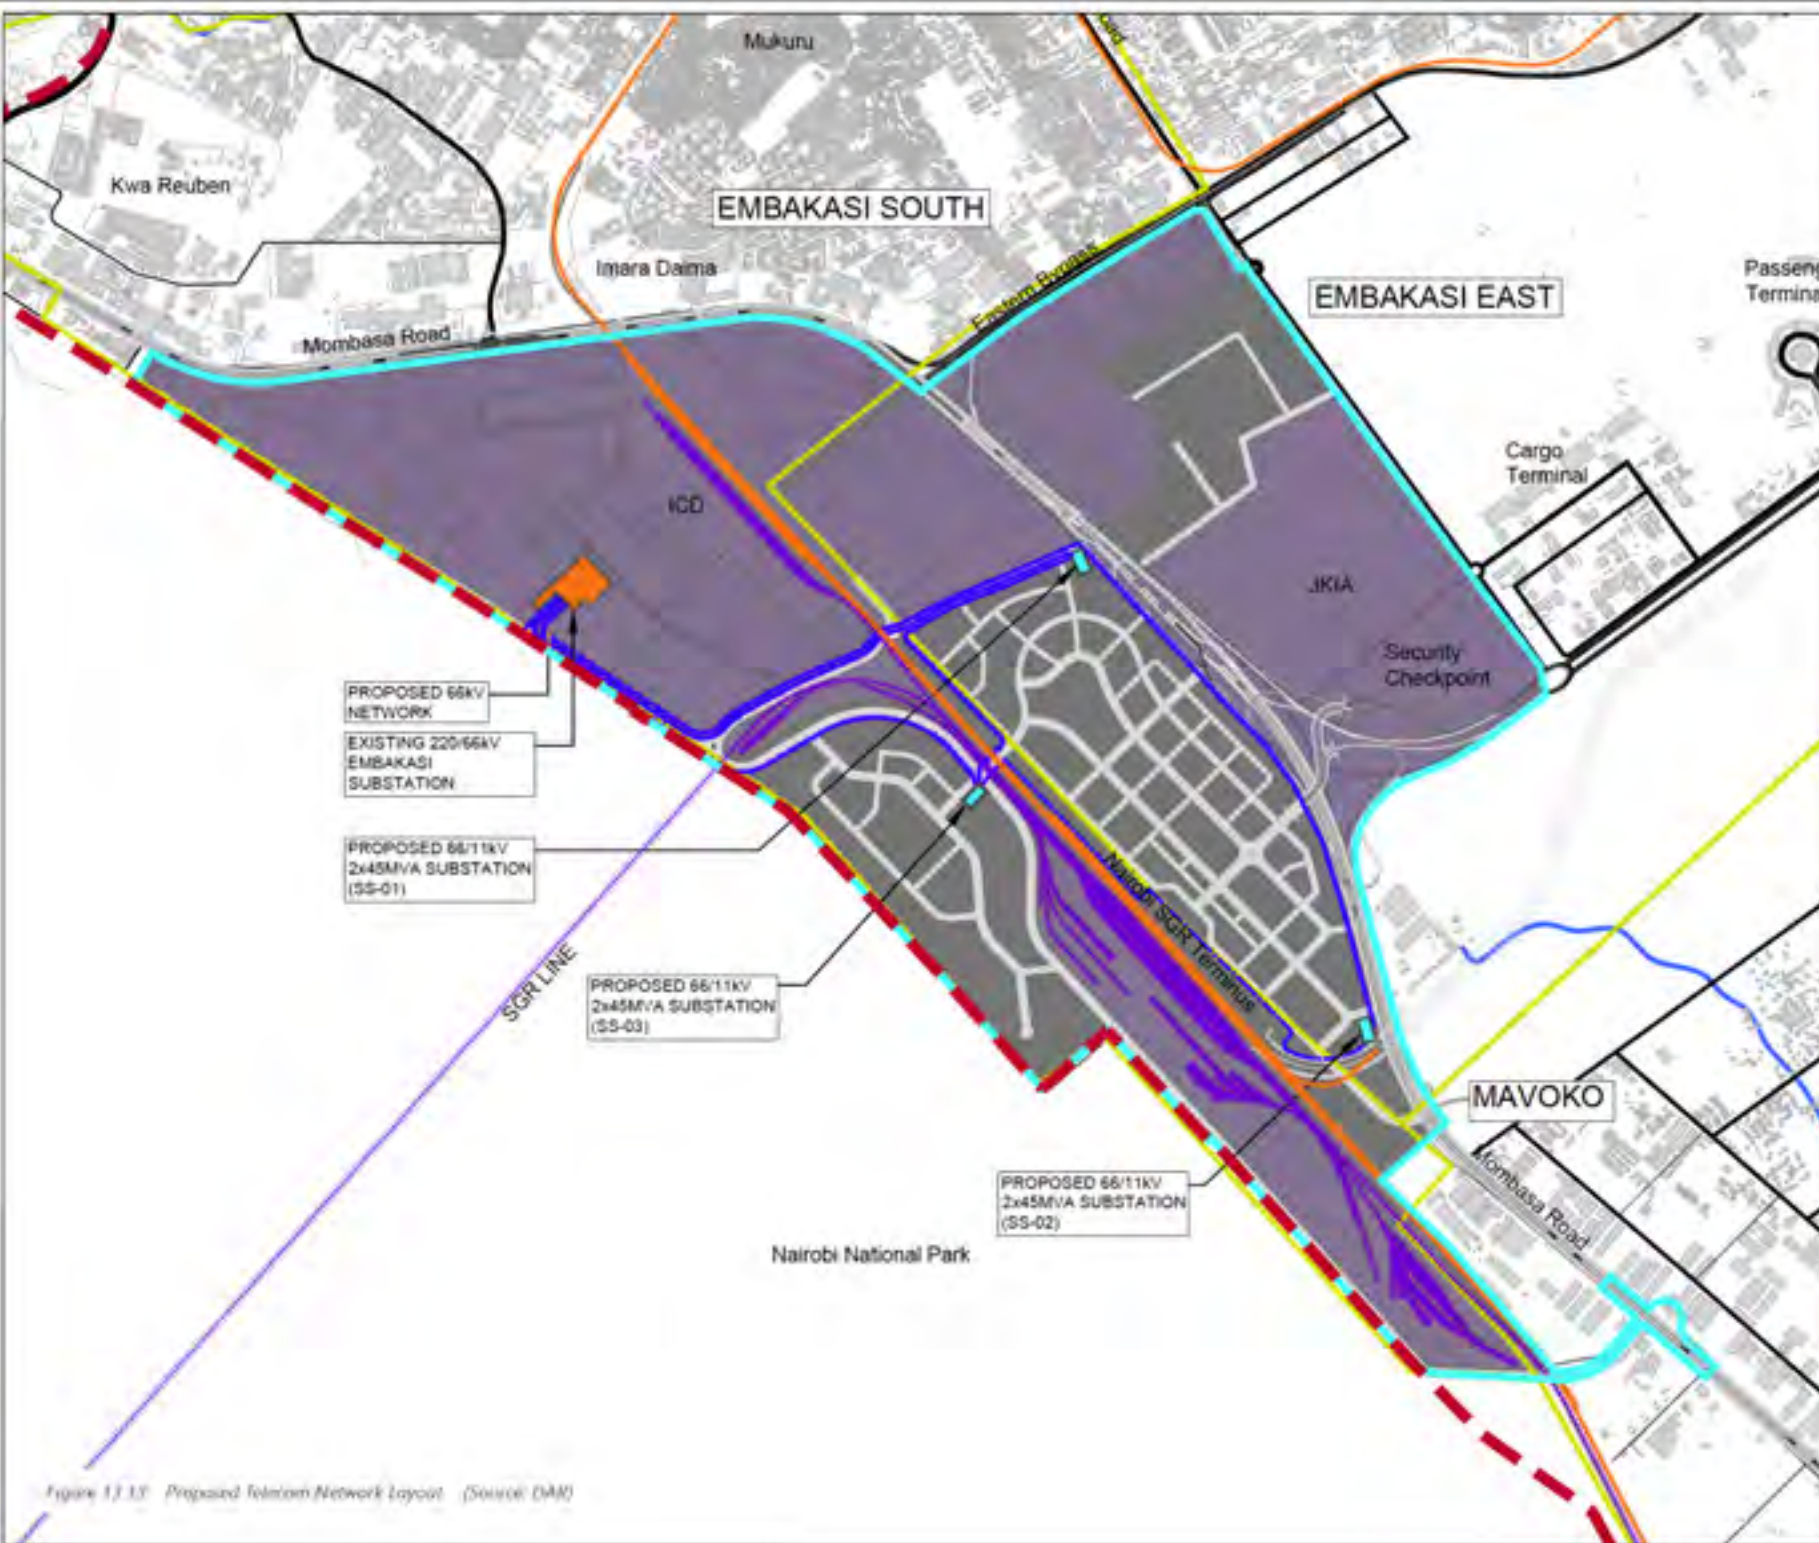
Proposed Telecom Network Layout (Source: DAR)
